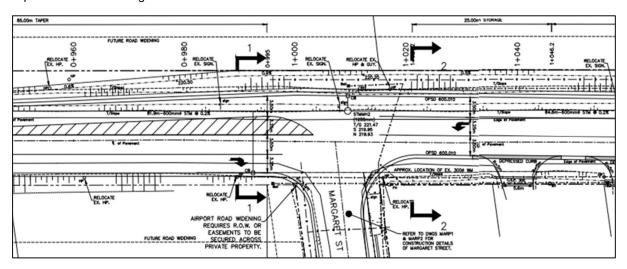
County Road 42 and Margaret Street Intersection Improvements
